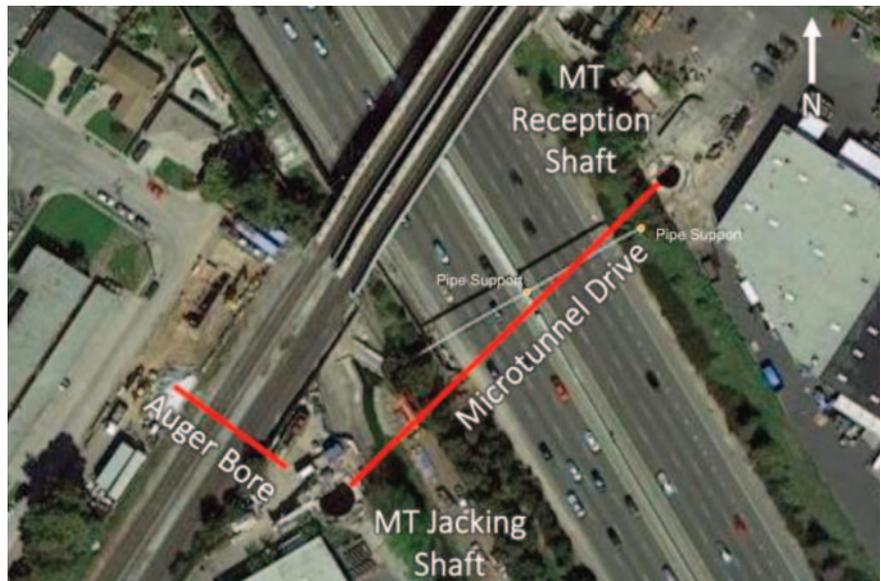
Aerial photograph showing the location of the shafts, microtunnel drive, and auger bore drive
